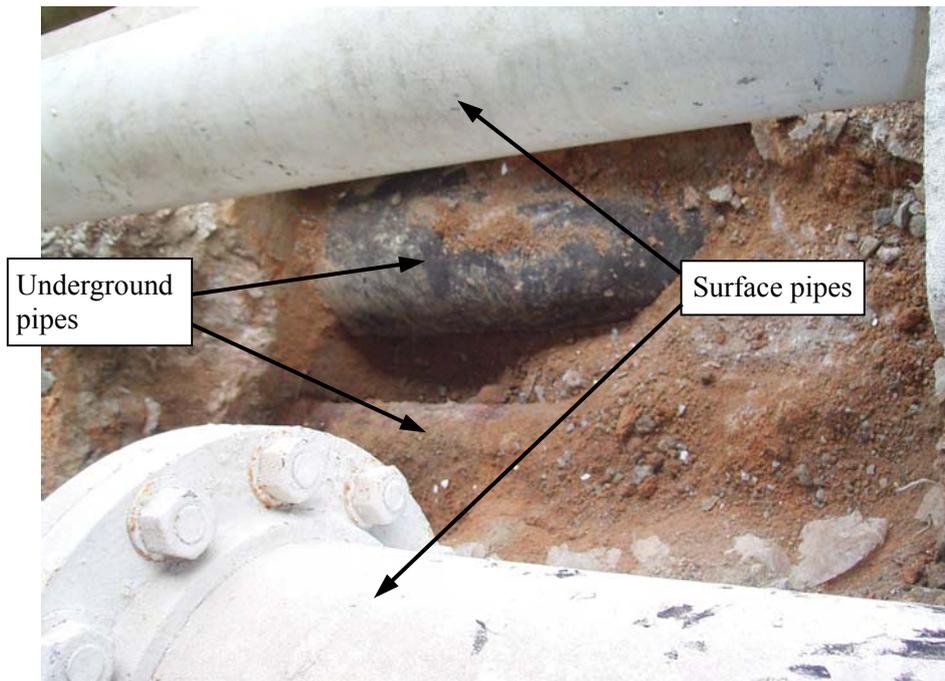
Underground Pipes Exposed in Inspection Pit No. P5 Excavated by EMSD
